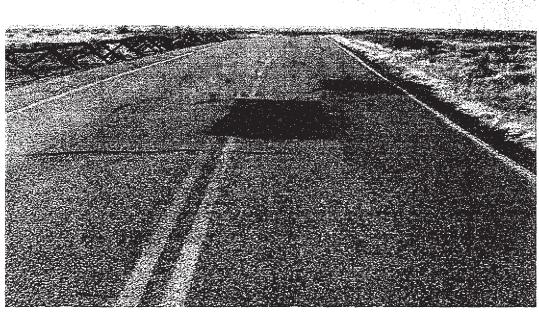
MP 23.70 - Typical Pavement Section, Note Patching
